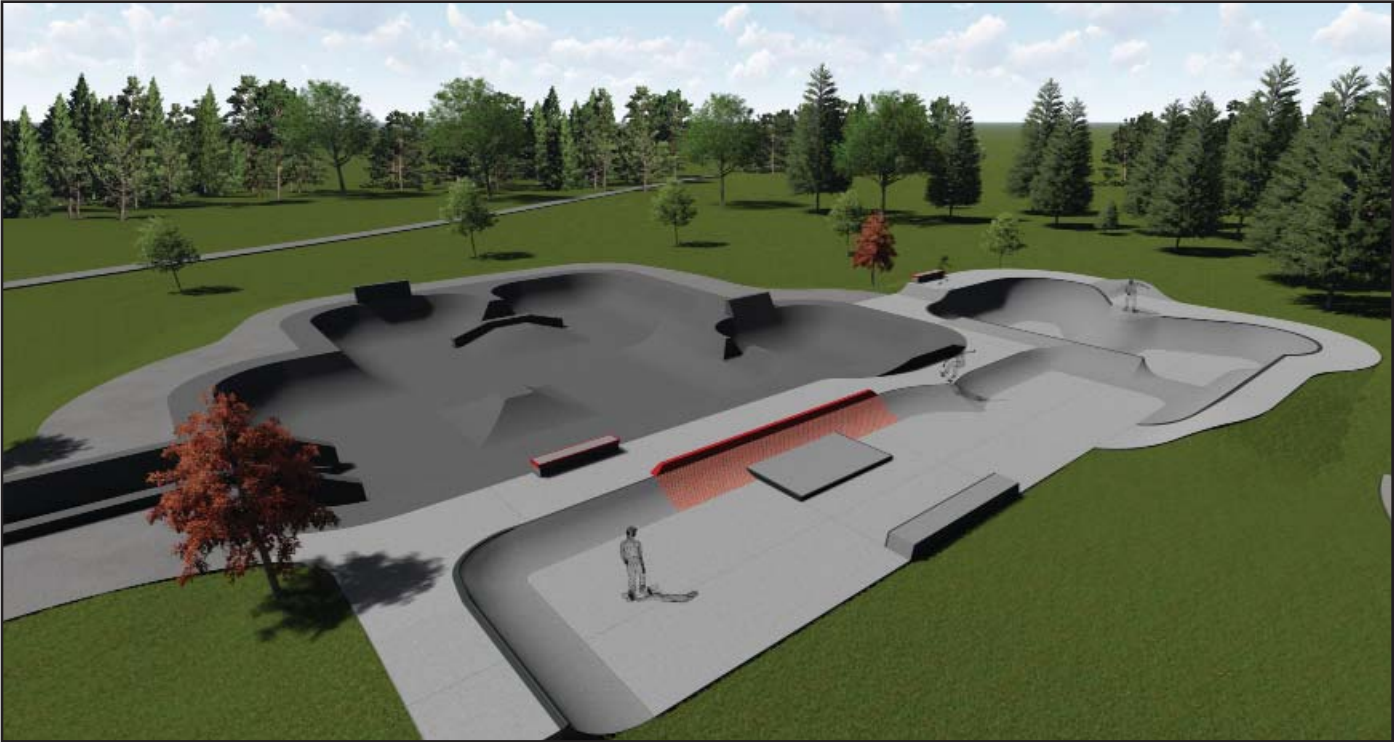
Muskoseepi Expansion - Concept Rendering - Street Section
